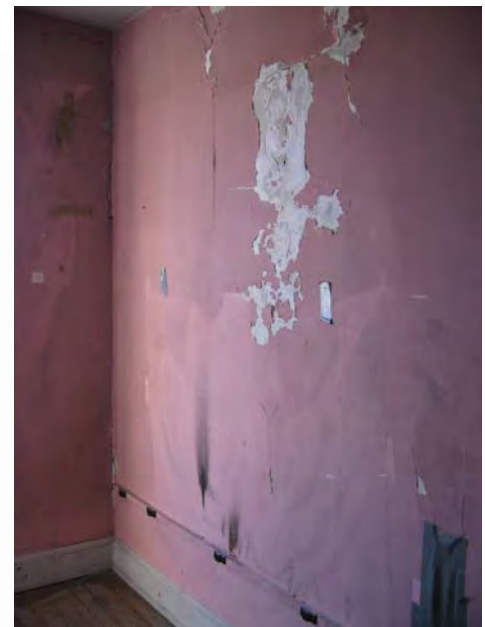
Water damage to plaster at south wall. (Photo: BBB, 2007)
